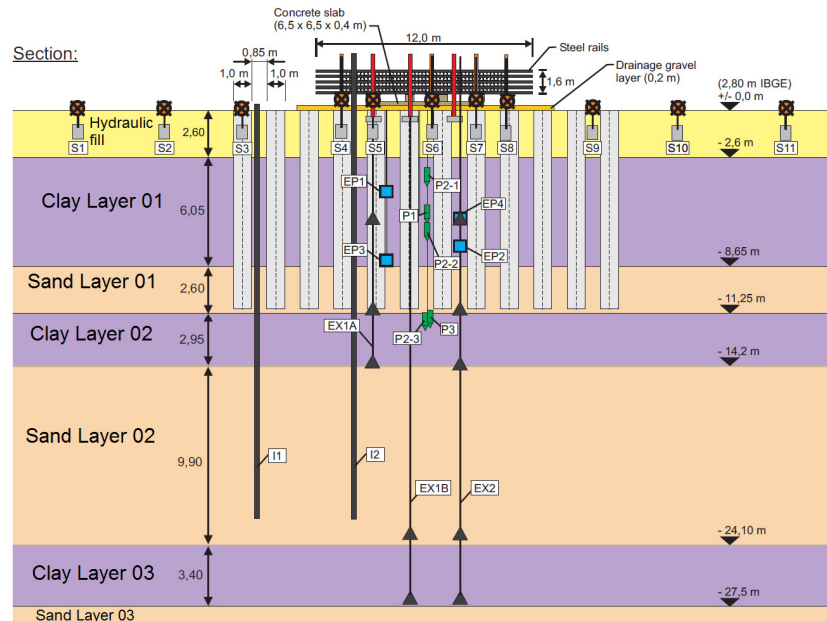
Soil profile, column spacing and diameter, and test area instrumentation (TKCSA, 2007)
